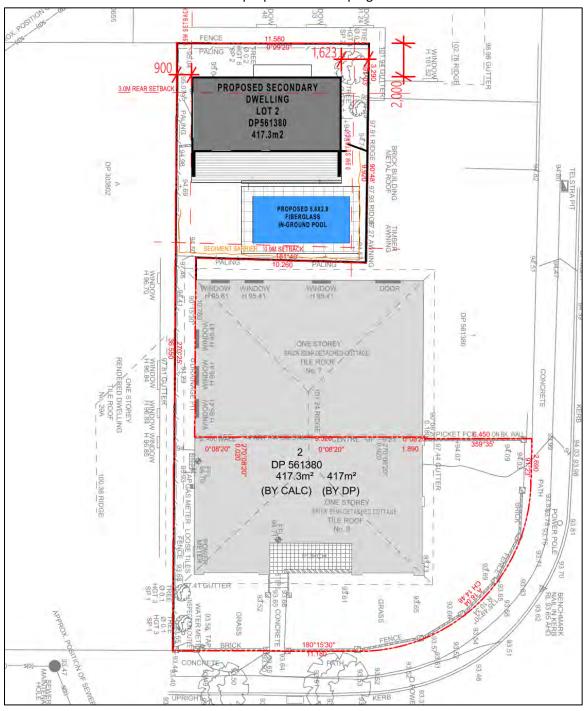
Proposed site plan of the secondary dwelling and pool in the rear yard.
